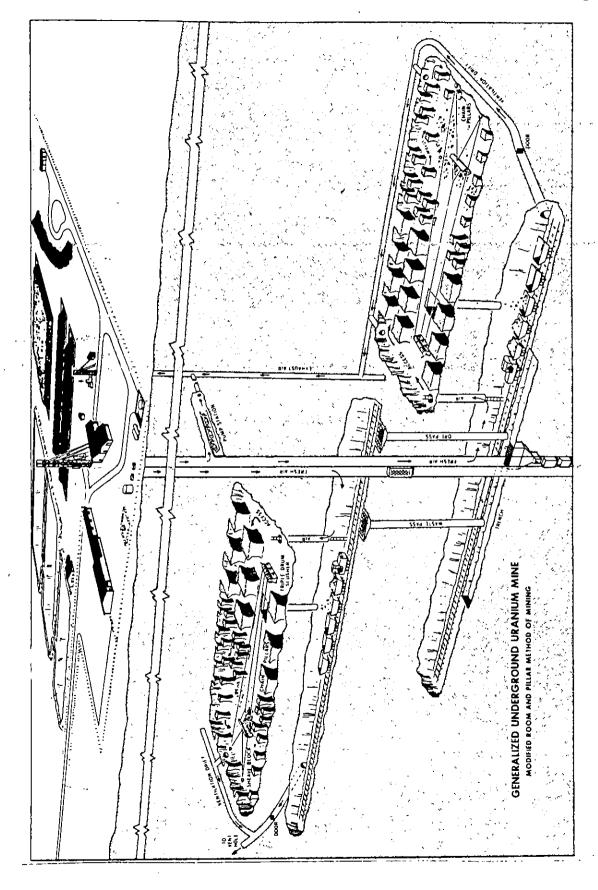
Generalized underground mine showing modified room and pillar method of mining (TVA78b)
